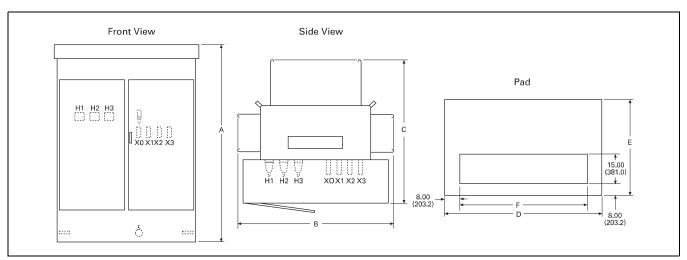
Pad-Mounted Transformer (3000-5000 kVA)—Dimensions in Inches (mm)
